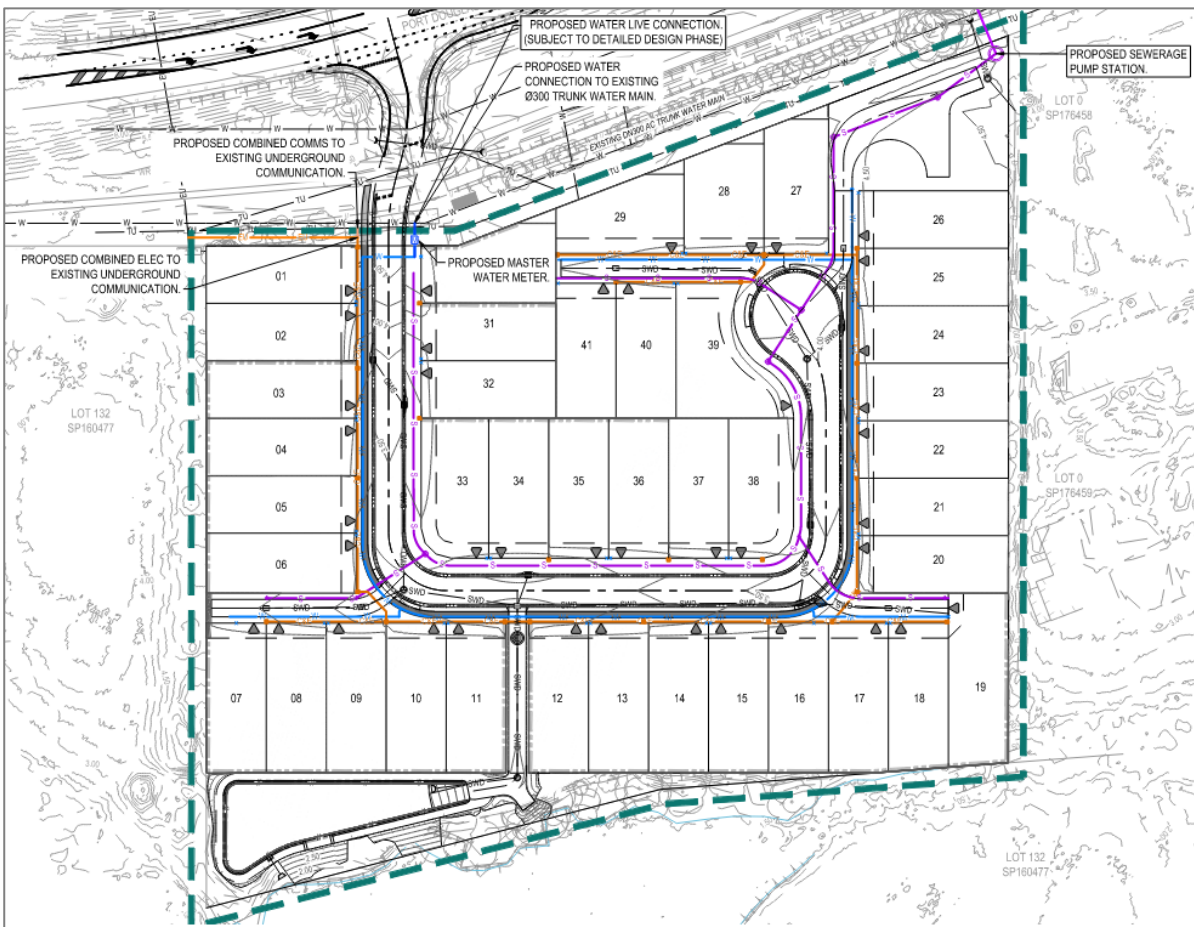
Preliminary Water and Sewer Reticulation Layout Plan
